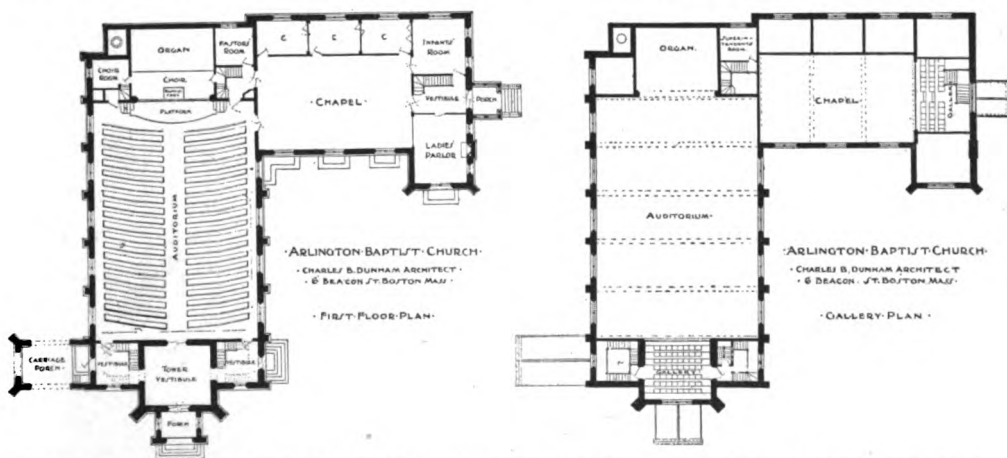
ARLINGTON BAPTIST CHURCH, ARLINGTON, MASS. RECTANGULAR AUDIENCE HALL PLAN, PULPIT ACROSS SHORT END, TRADITIONAL SUGGESTION.
